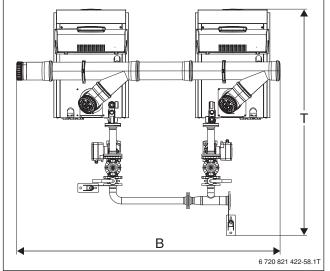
2-boiler cascade, lane installation (dimensions → Table 30, page 79)
